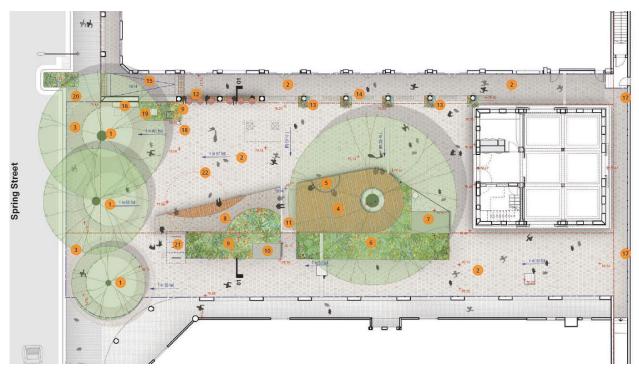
Extract of Landscape Plan (Source: Aspect Studios)
